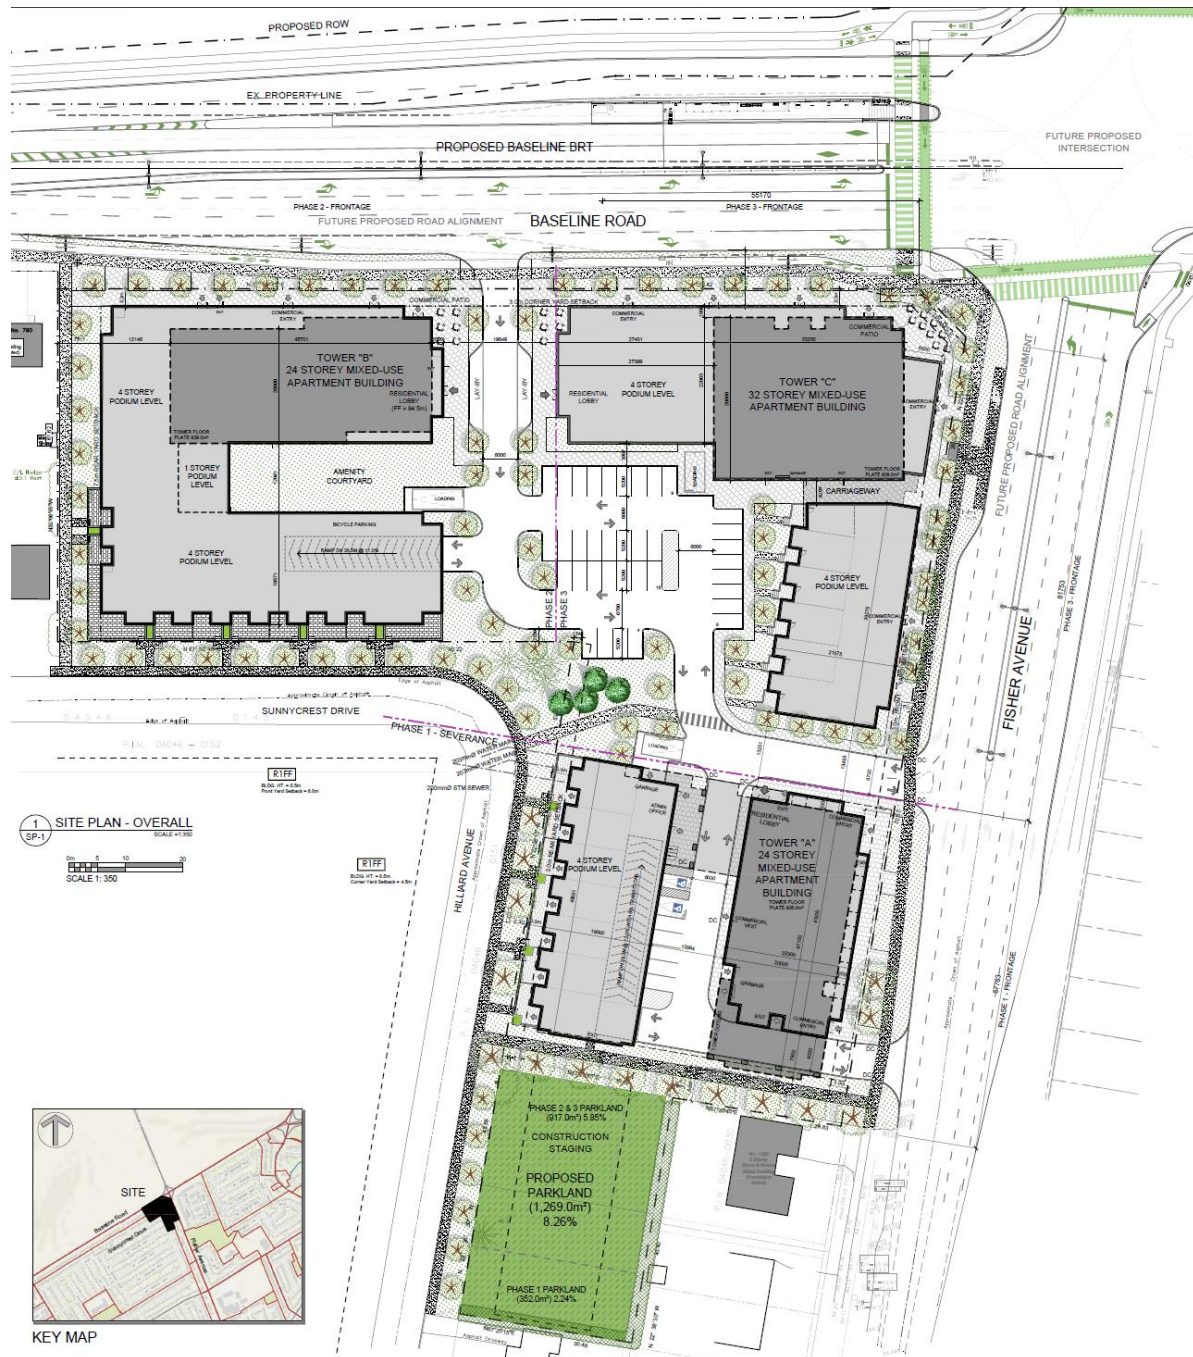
Site plan illustrating the full build-out of the property with two towers along Baseline and the phase 1, 24-storey tower setback along Fisher Avenue. Source: Rodrick Lahey Architect Inc. 2023
